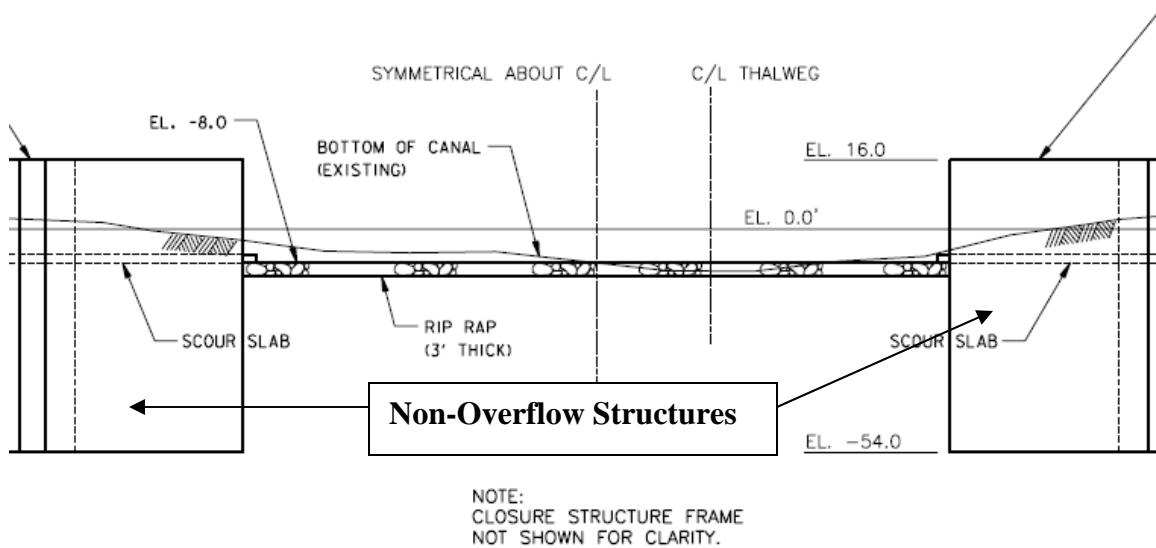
London Avenue Phase 1 Riprap Protection Pad Detail
